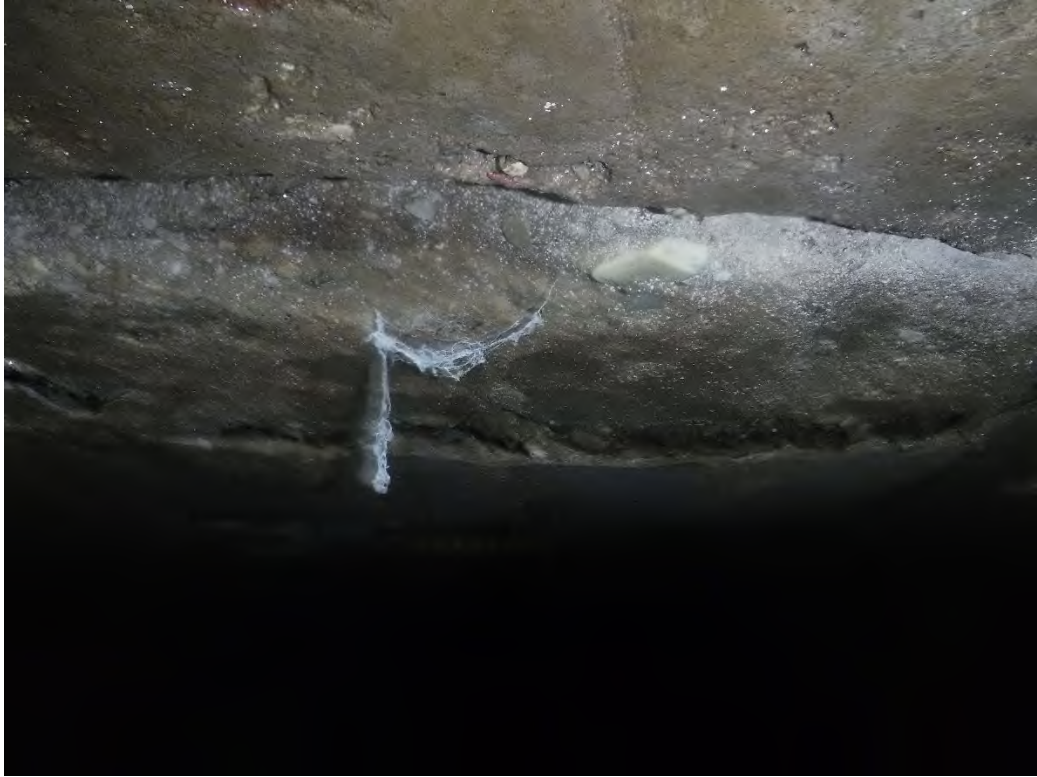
STA. 20+45 to 20+59 ceiling failure.
